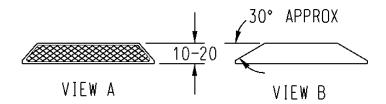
Perspective views of retroreflective road pavement markers for hydrants.
